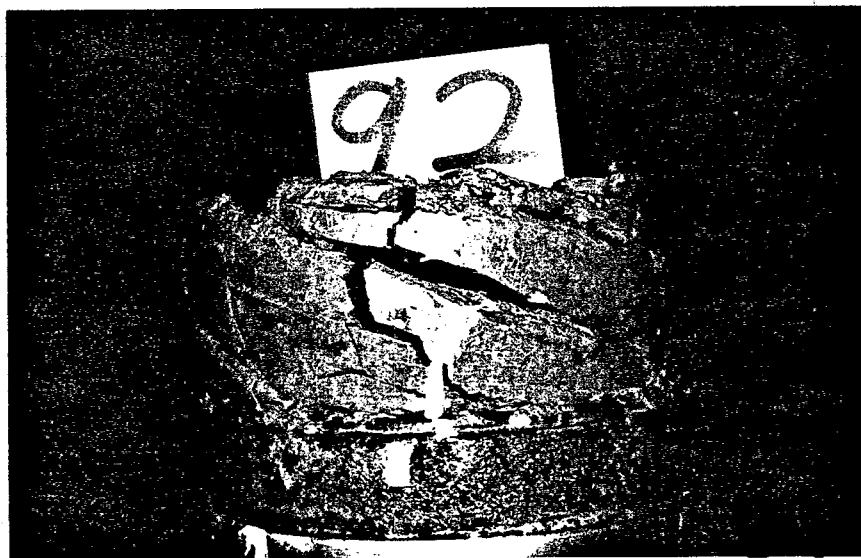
Torsioned Specimen of Loading 92, A Rather Impermeable Little Cemented Specimen
